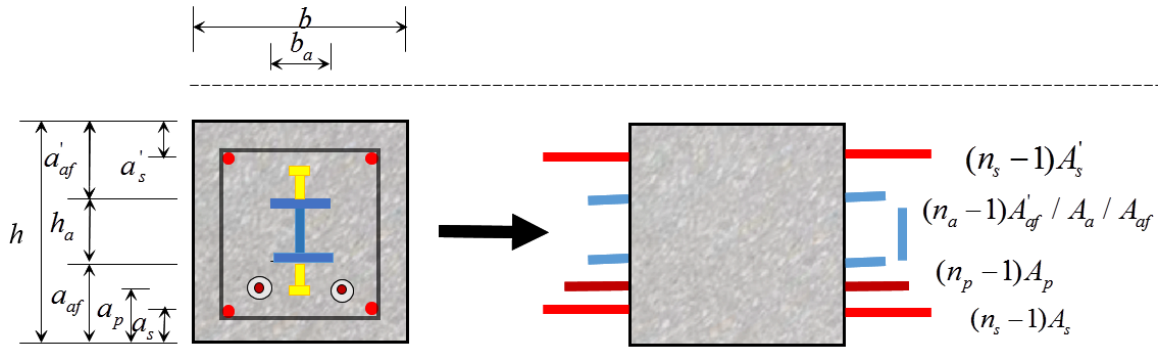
Conversion section of steel reinforced concrete members with prestressed CFRP tendons
